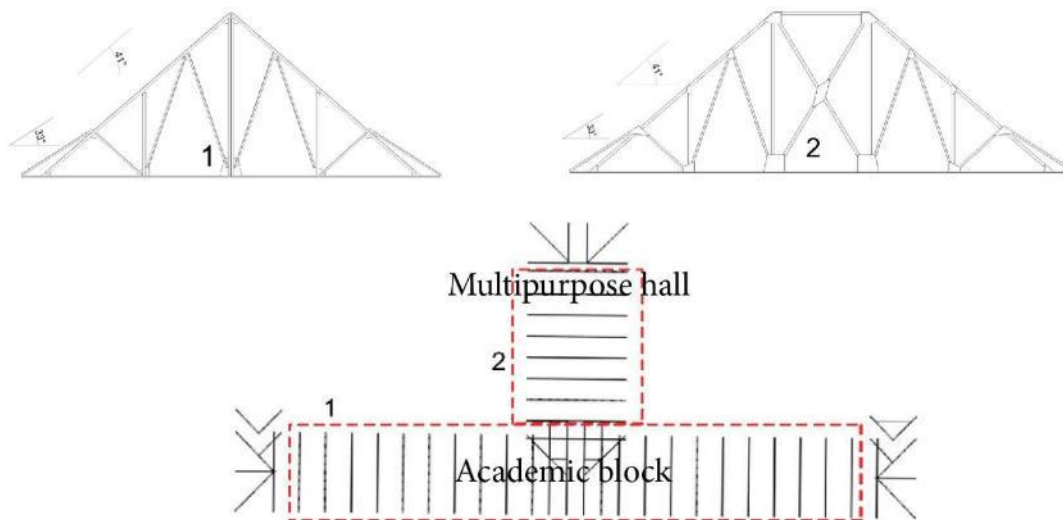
Type of roof trusses used at the multipurpose hall and academic block
